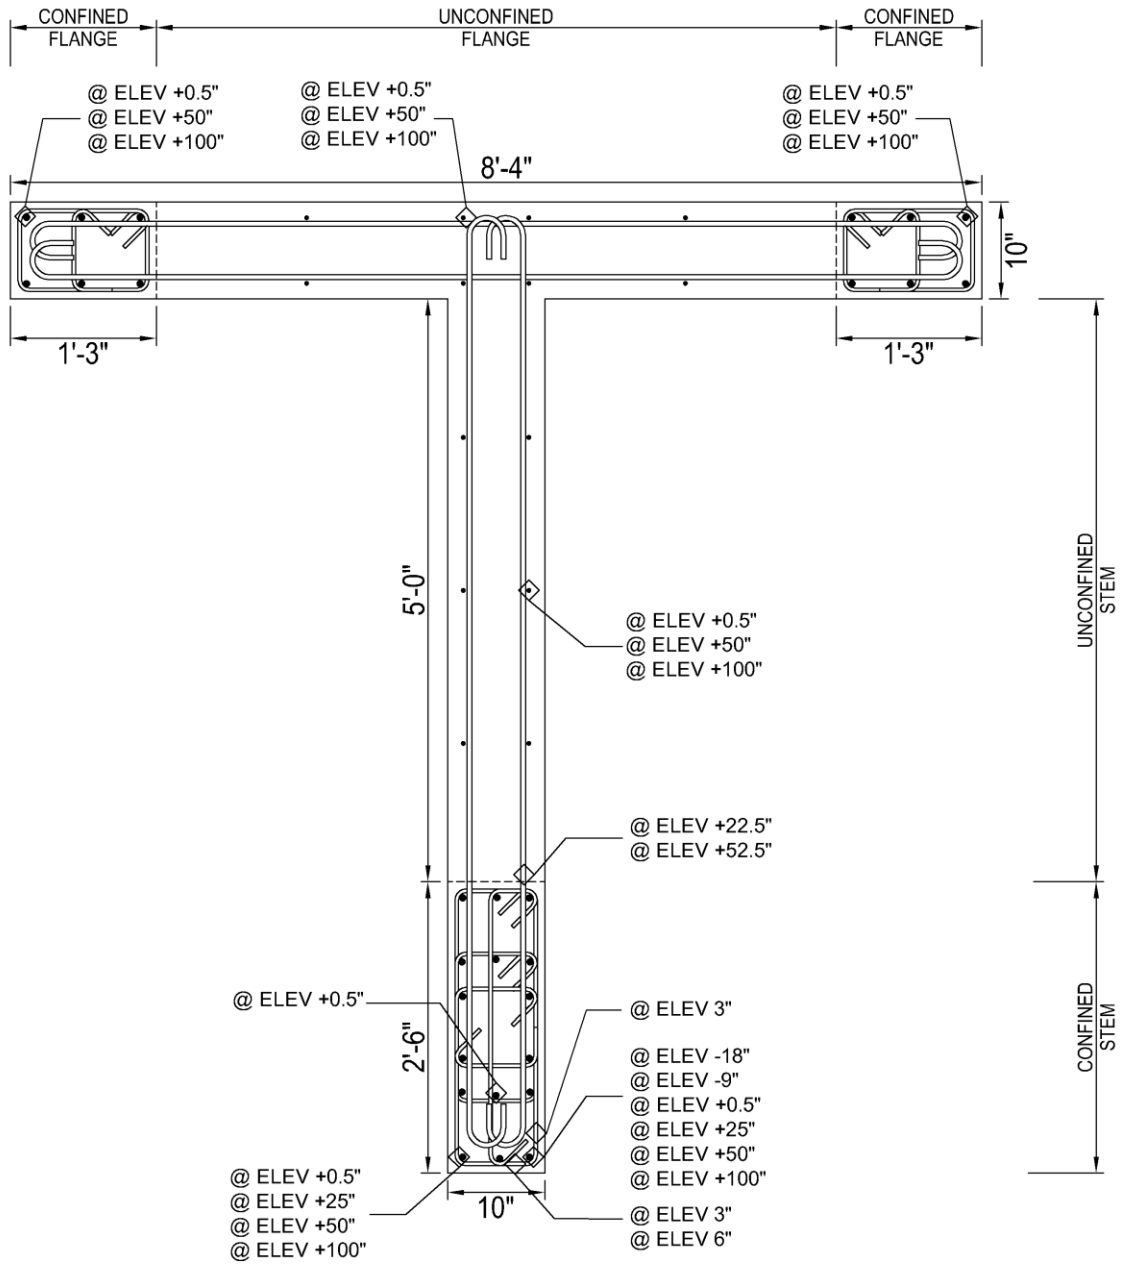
Wall T3 strain gauge locations (1 in. = 25.4 mm)
